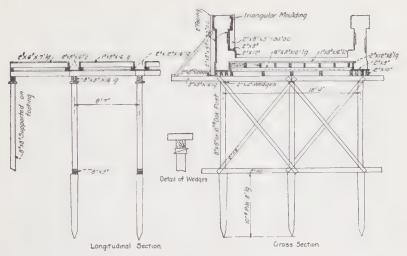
Formwork for through concrete bridge of 60 ft. span and 16 ft. roadway.
